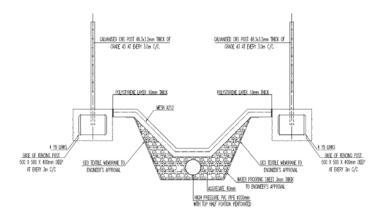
Typical Cross Section of Surface Drainage (source: JET)
